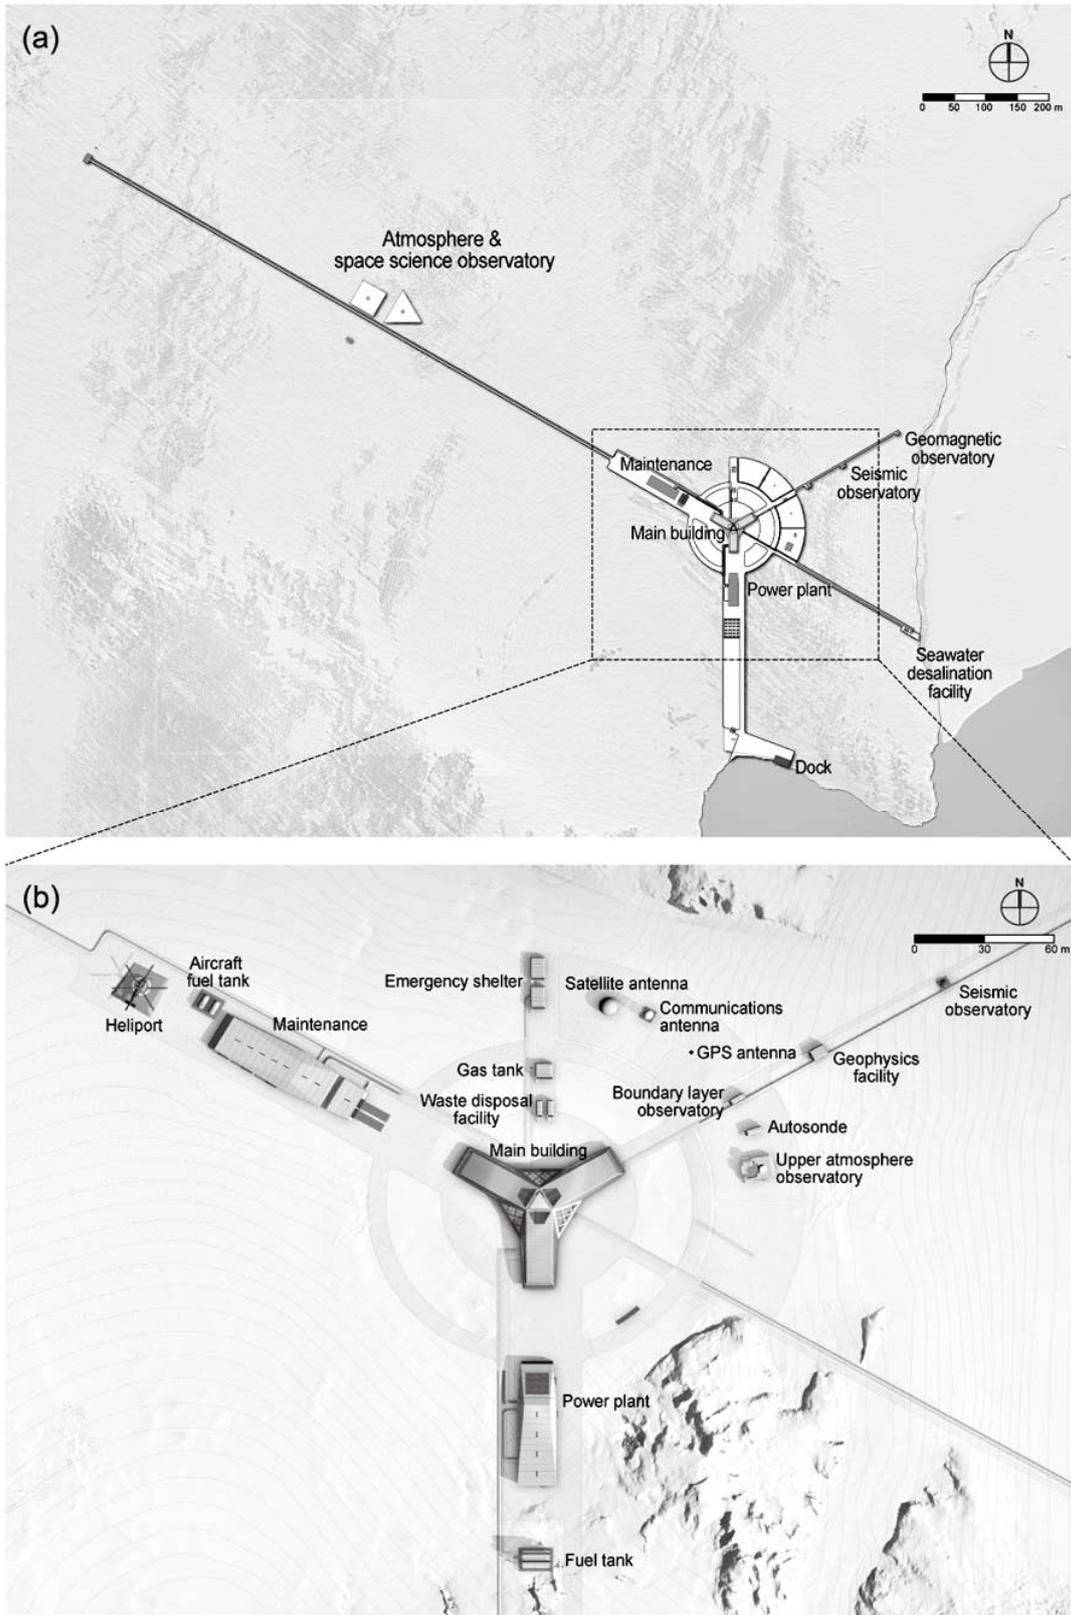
Layout of the Jang Bogo Station. (a) Layout plan based on activities, (b) Arrangement of facilities.
